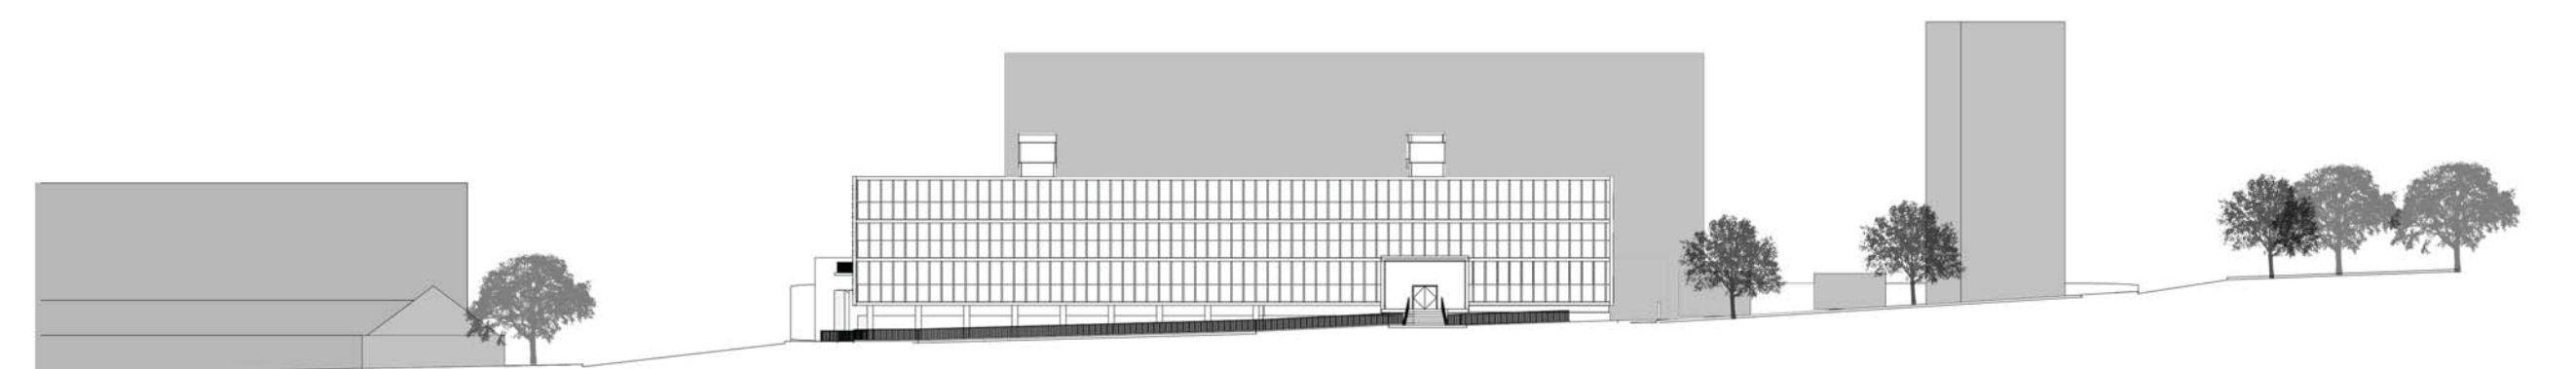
East West Site Section showing the scale of the Meat Board building in its context.
